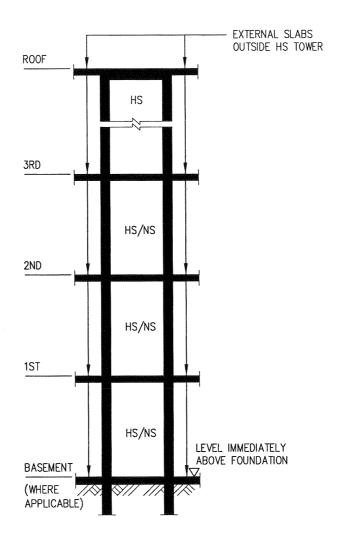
(b) HS WALL ABUTTING AN AIR WELL IN A LANDED DWELLING UNIT
